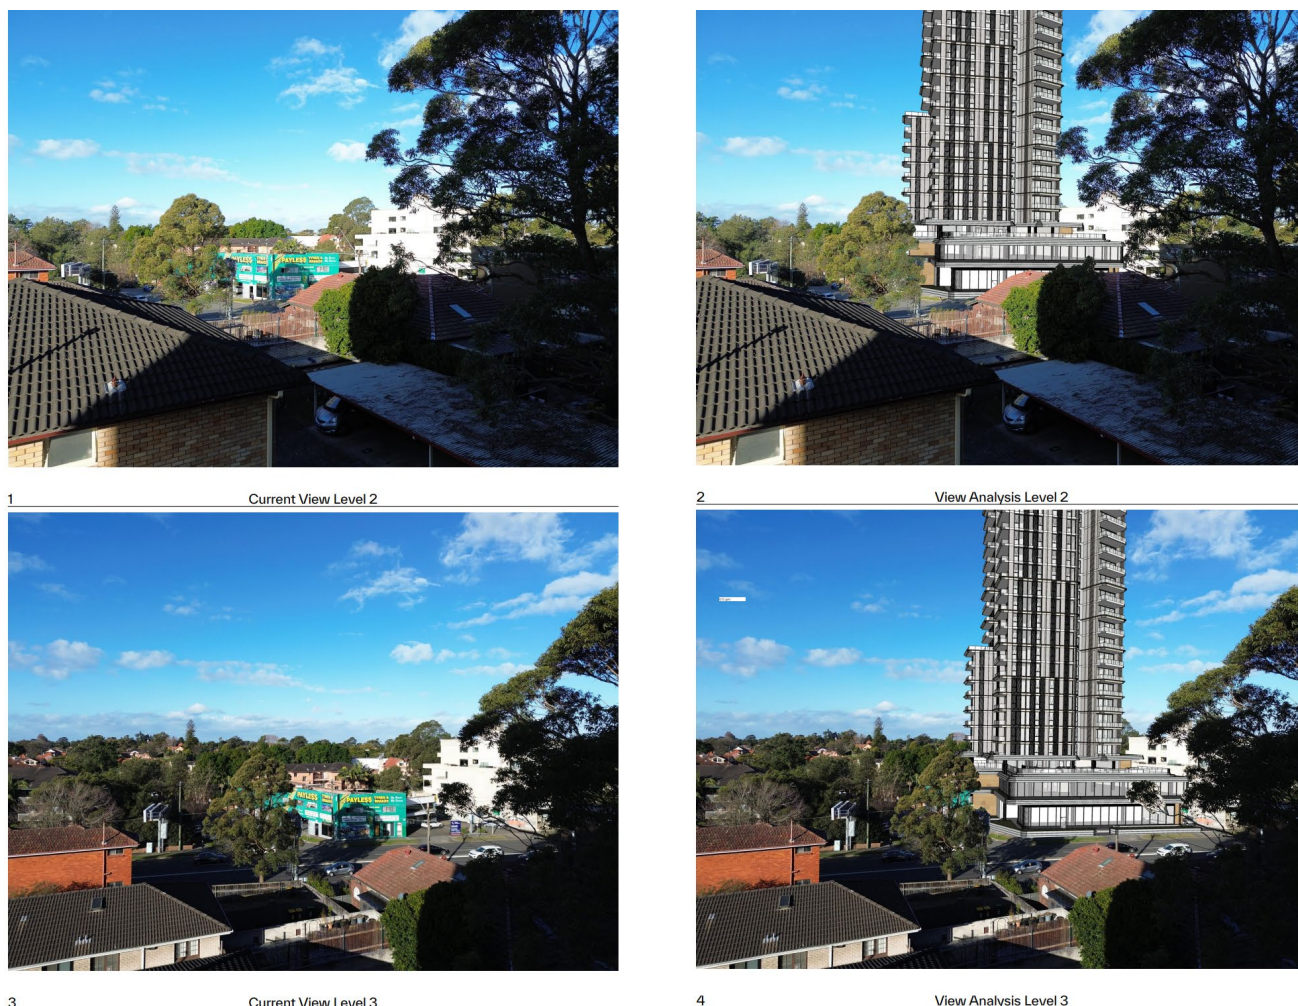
Drone photos and 3D modelling of existing views and proposed views from Level 2 & 3, 8 Sutherland Road, Chatswood (Source: Polytec and PBD Architects)
